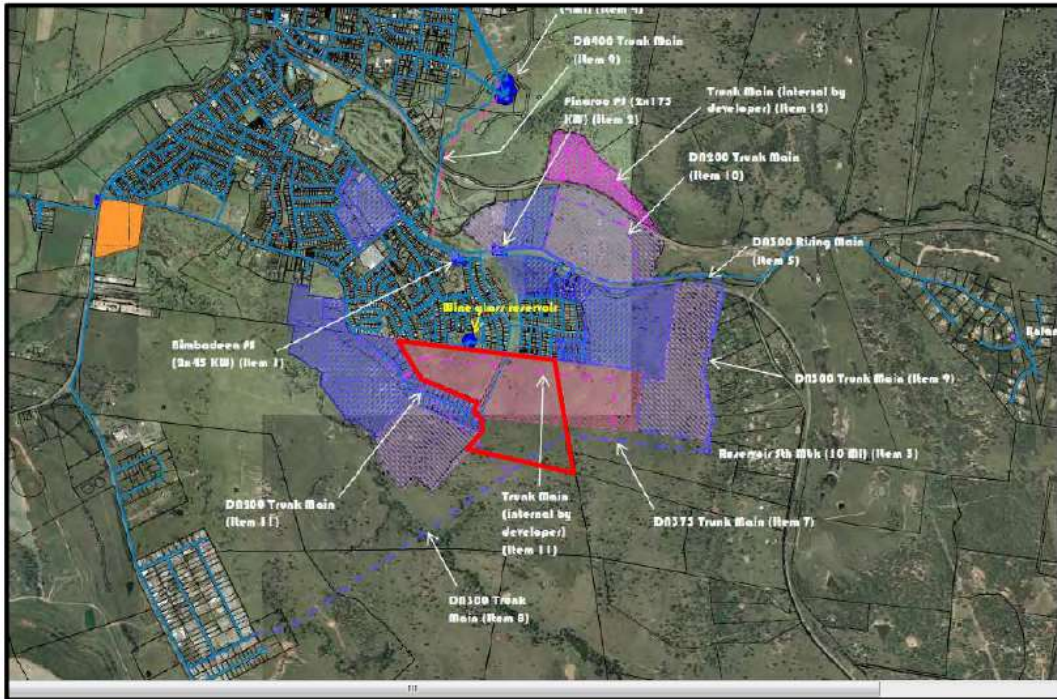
Extract from MSC Developer Servicing Plan – Sewer
